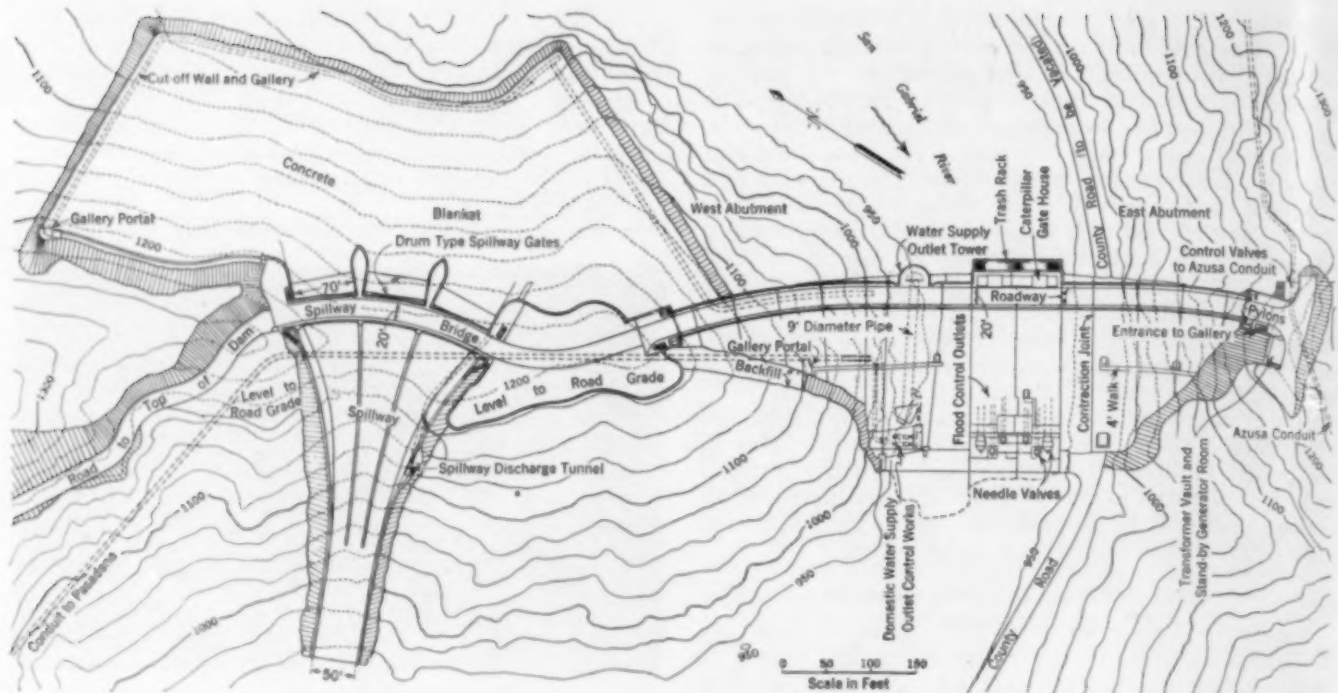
GENERAL PLAN OF MORRIS DAM AND APPURTENANT WORKS
